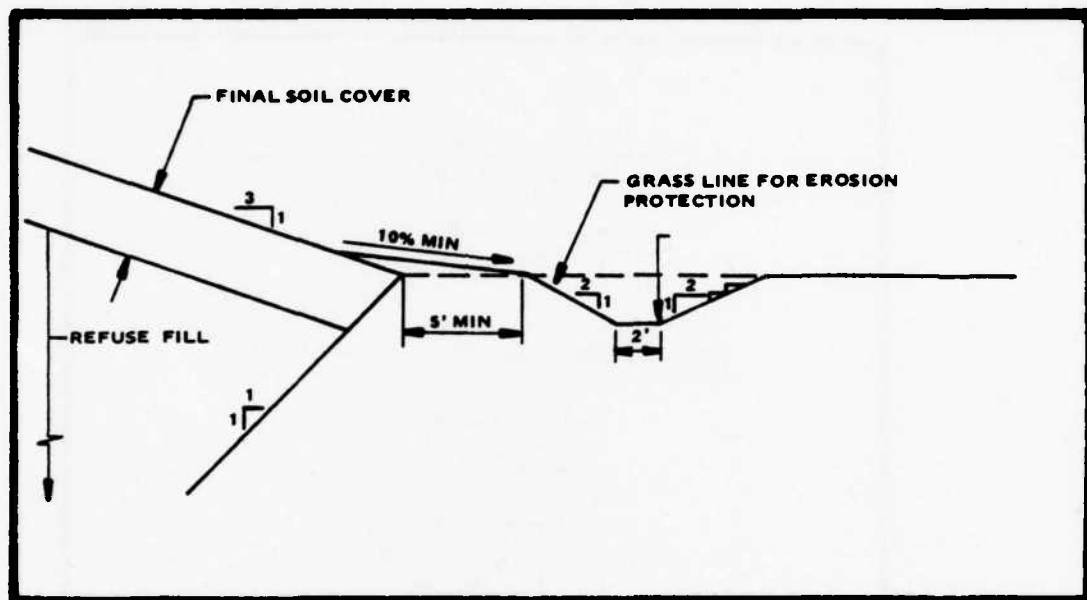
Typical Diversion Ditch at Base of Disposal Site
